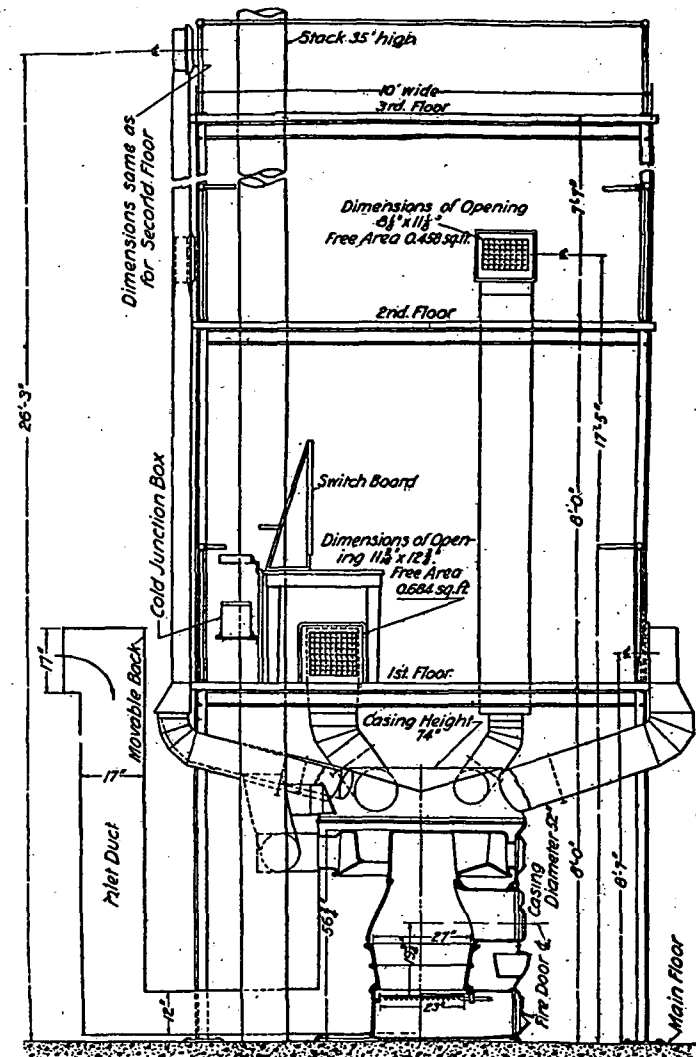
ELEVATION OF PIPED FURNACE TESTING PLANT—NOTE ALTERNATIVE AND BETTER ARRANGEMENT OF RECIRCULATING DUCT IN FIG. 45
